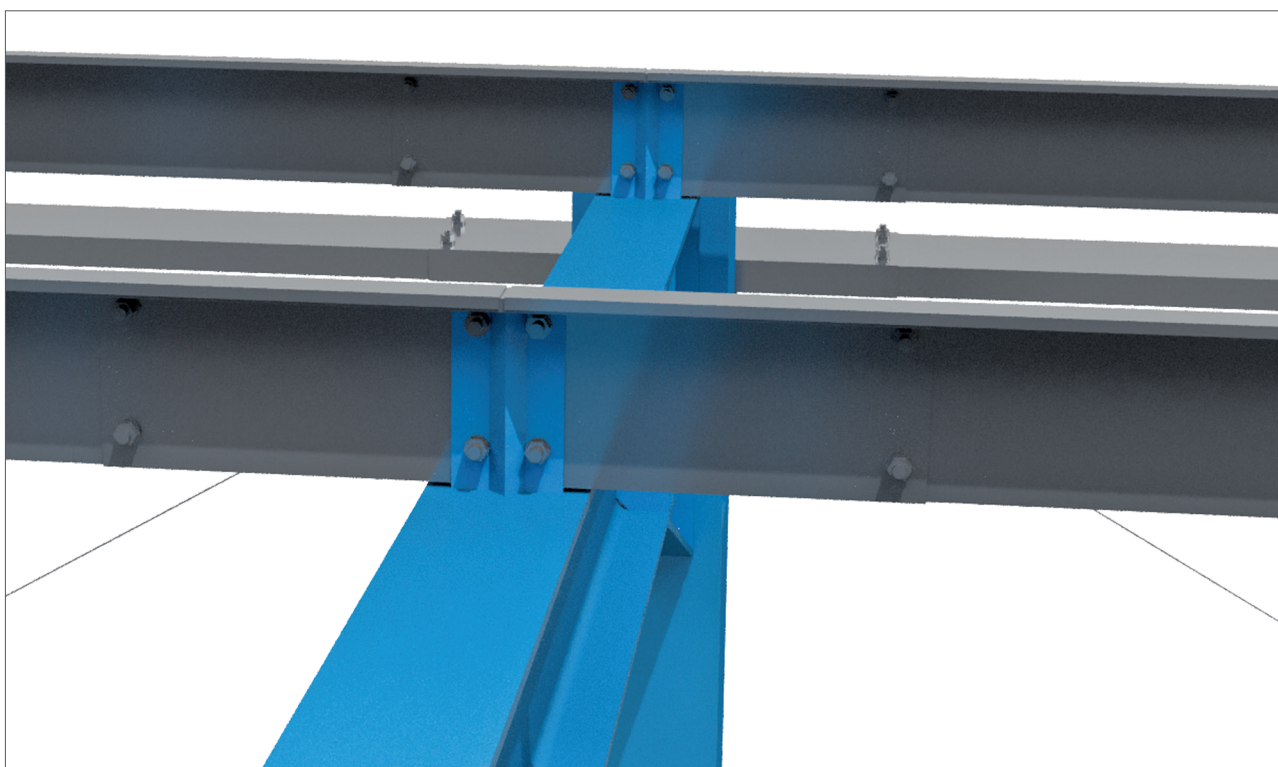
Detail of the purlin/sleeve connection to the primary structure in the SLEEVED system
